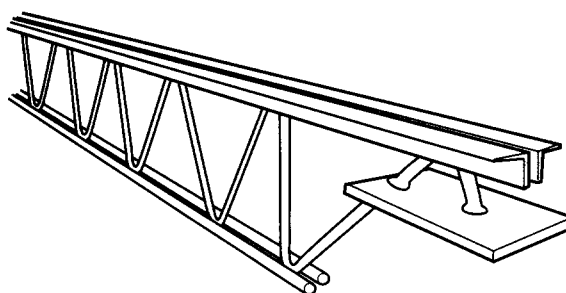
(b)(i)2 Open-web bar joist construction.
